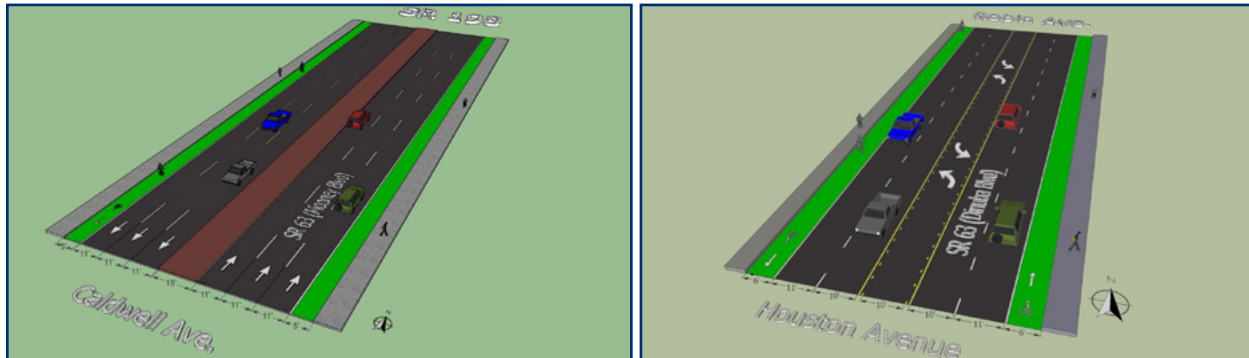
also shows proposed bike lanes for the 0.8-mile segment of N Dinuba Blvd from W Houston Avenue to W Robin Drive. In this road segment, travel lanes will be narrowed from 12 feet to 10 or 11 feet in order to provide 5-foot Class II bike lanes with green paint in conflict areas. The construction work is anticipated to start in spring of 2023.
